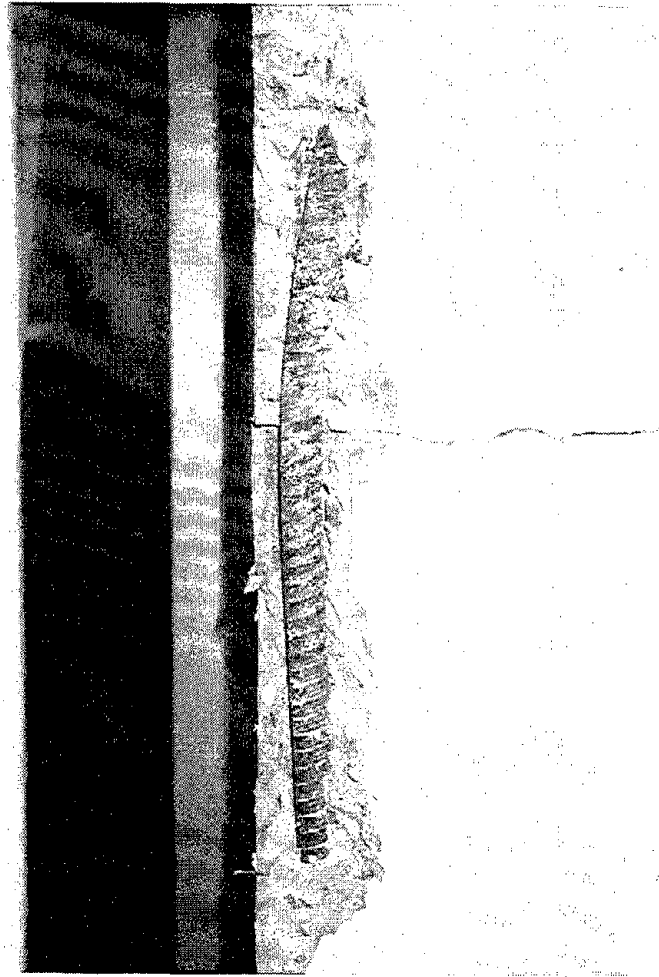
VA Hospital Bldg. #40. Same interior column as Figure 15.19 along north wall. Reinforcement bar (#7) buckled due to lack of lateral ties.
